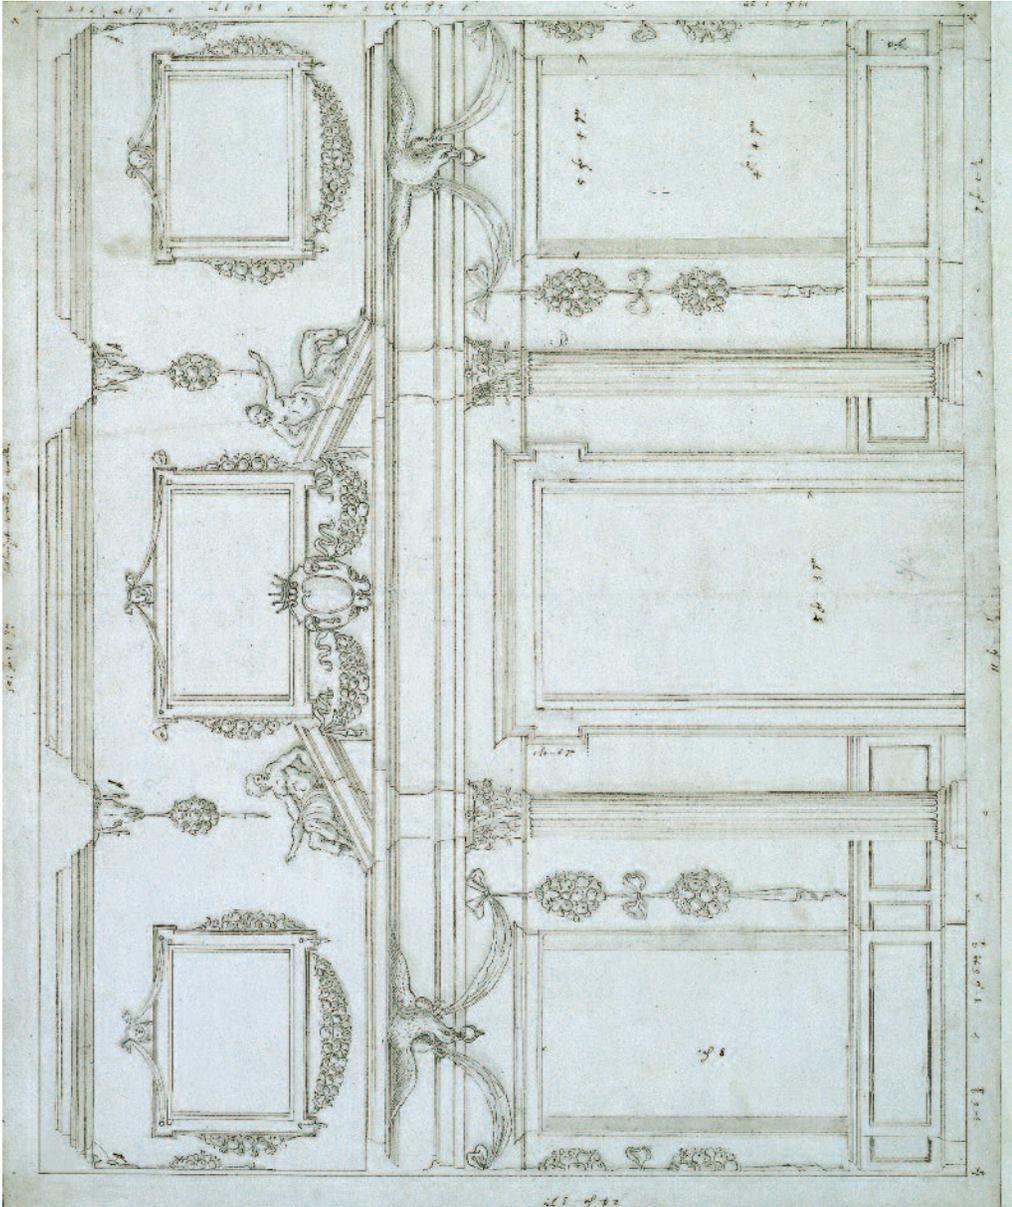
John Webb, proposed elevation of north wall of Great Room at Chevening.
